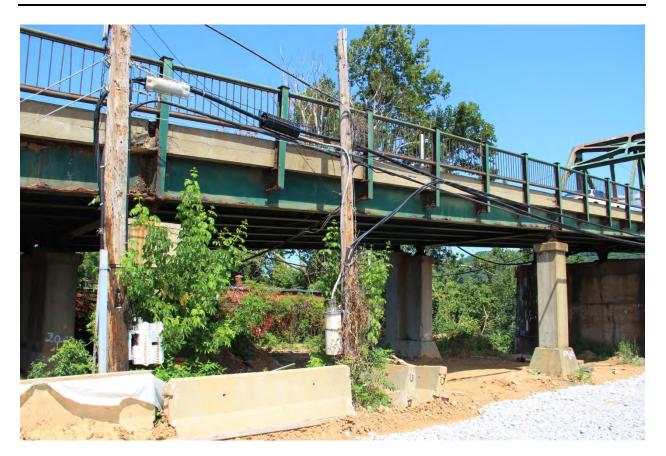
SOUTHEAST ELEVATION OF SOUTHWEST VIADUCT SPAN NO. 4 SHOWING VIADUCT PEDESTAL NOS. 3 AND 4, FACING NORTHWEST.
